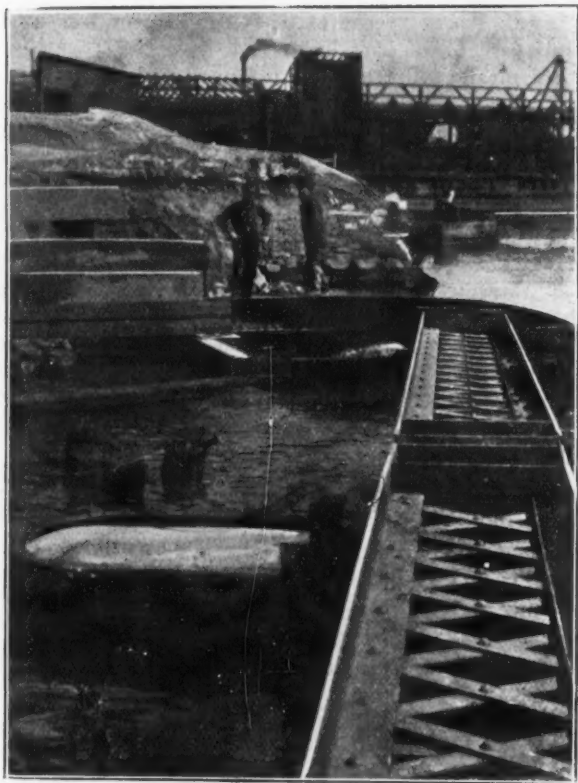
Steel Girders for Baltimore Docks, Later Inclosed in Concrete, Ends Resting on a Completed Concrete Pier.
